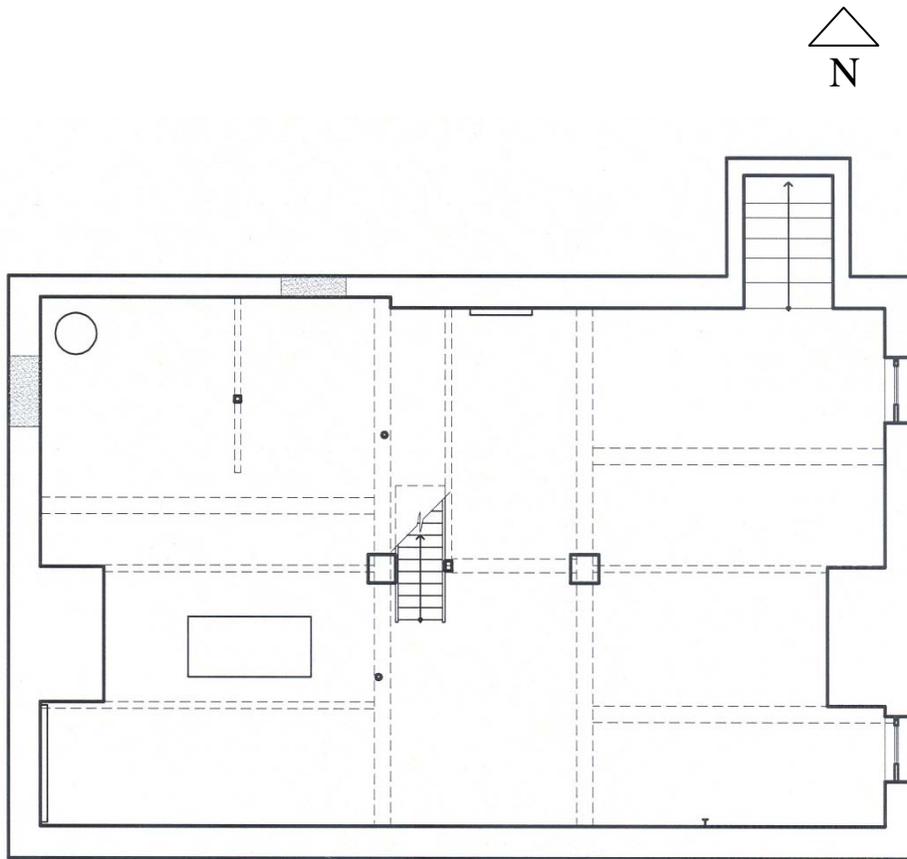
Cellar plan of the Hunt House, December 2006. Not to scale.
